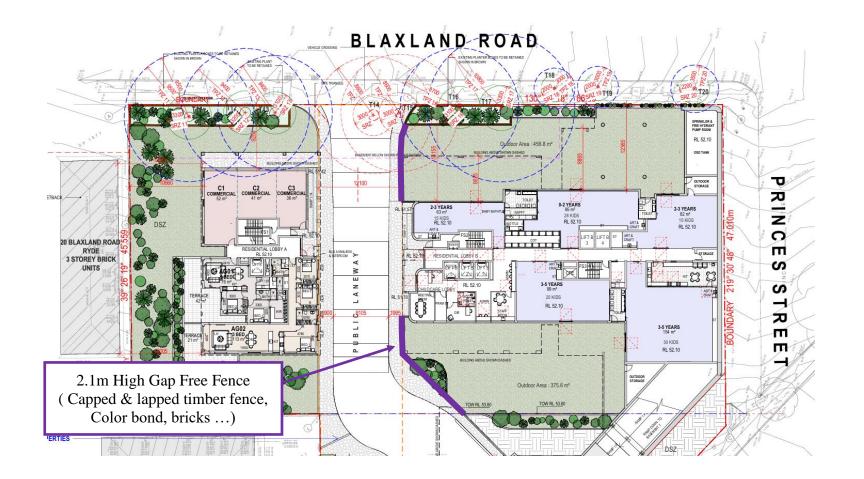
Proposed Sound Barrier Locations – Childcare Centre (Ground Floor)
